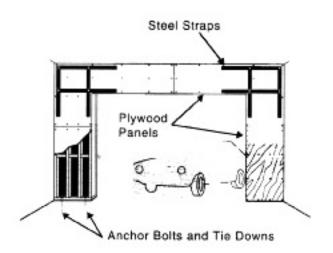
Bracing garage walls. If your house has a room over the garage, the garage walls may not be strong enough to hold up during an earthquake unless they are braced with plywood panels.
